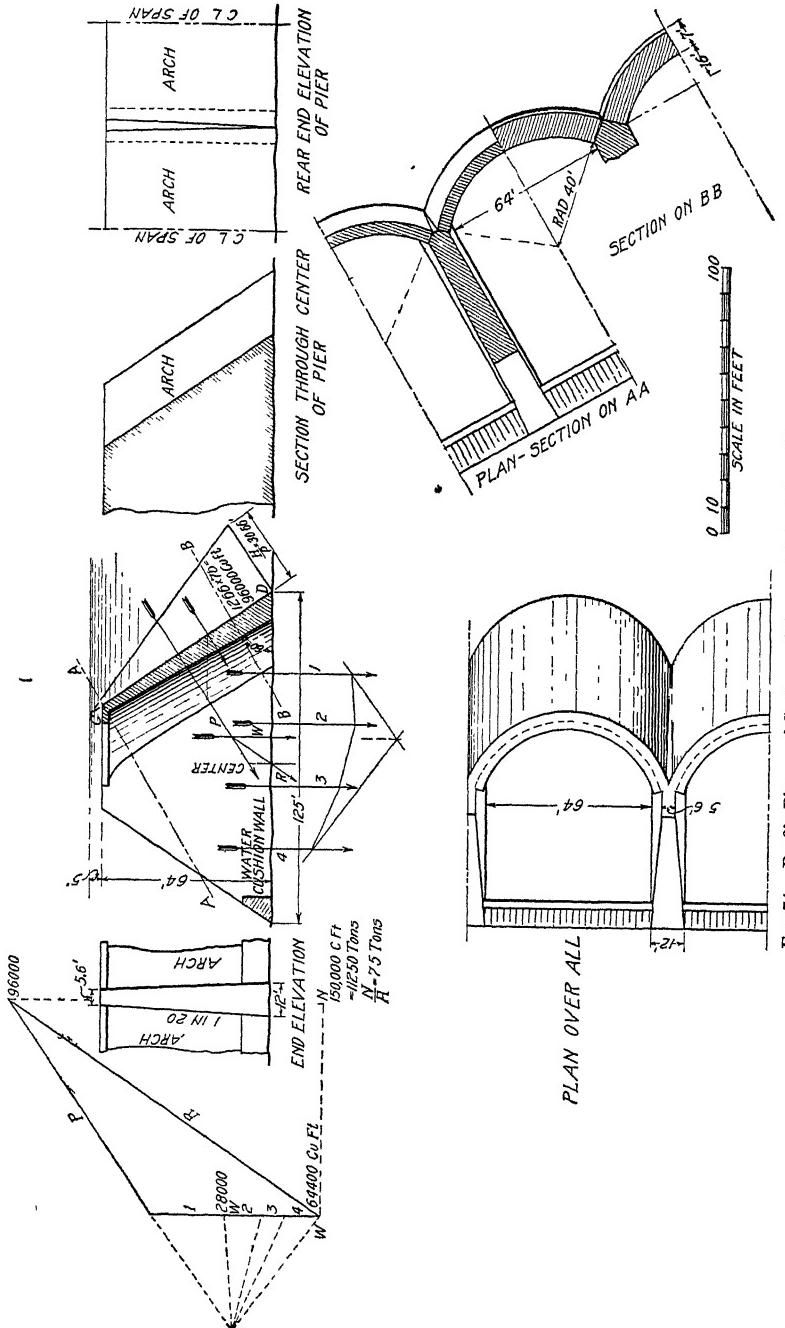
Profile Plans and Sections of Segmental Arch Panel Dam
